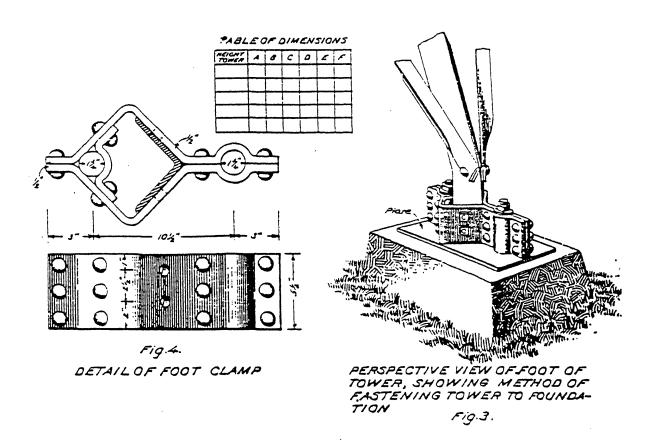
Standard details of Aermotor lookout towers. (W. B. Greeley, Specifications and Plans for Lookout Towers. Washington, DC: U.S.D.A. Forest Service, 1924)
